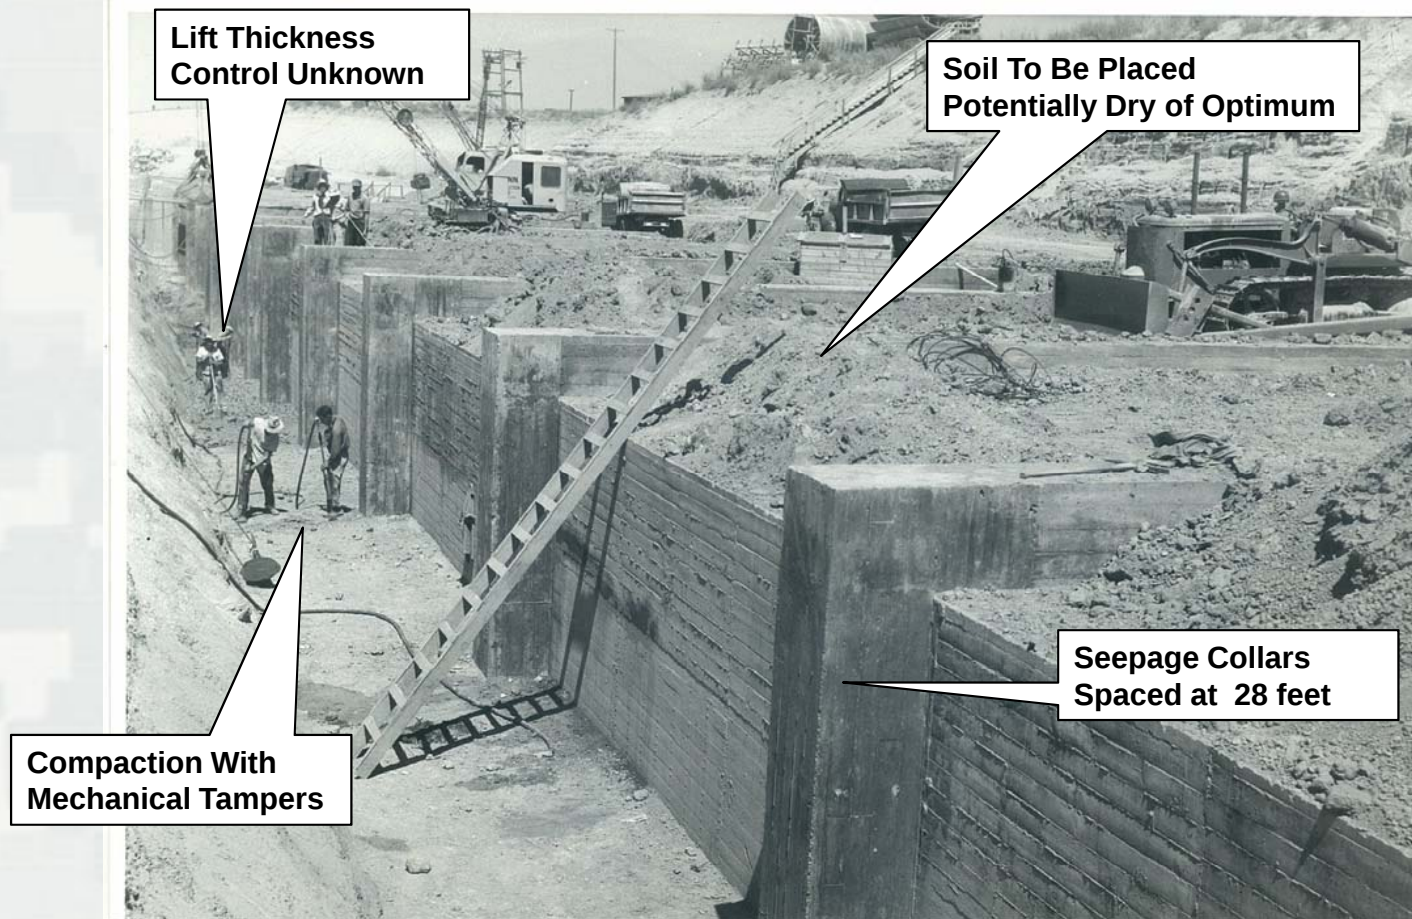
Outlet works contract. Looking downstream near Sta. 10+00, showing backfill procedures adjacent to conduit. (20 Aug '48)
